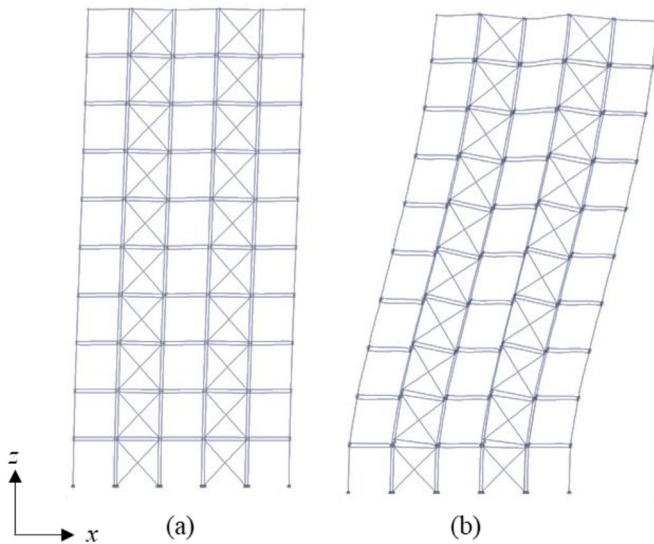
Lateral deformed shape of 10-storey modular buildings with bracings under wind load X-direction for (a) pin-ended (releasing out-of-plane rotational restraint, fixing the in-plane rotational restraint) (i.e., Case 3), and (b) spring model (i.e., Case 4).
